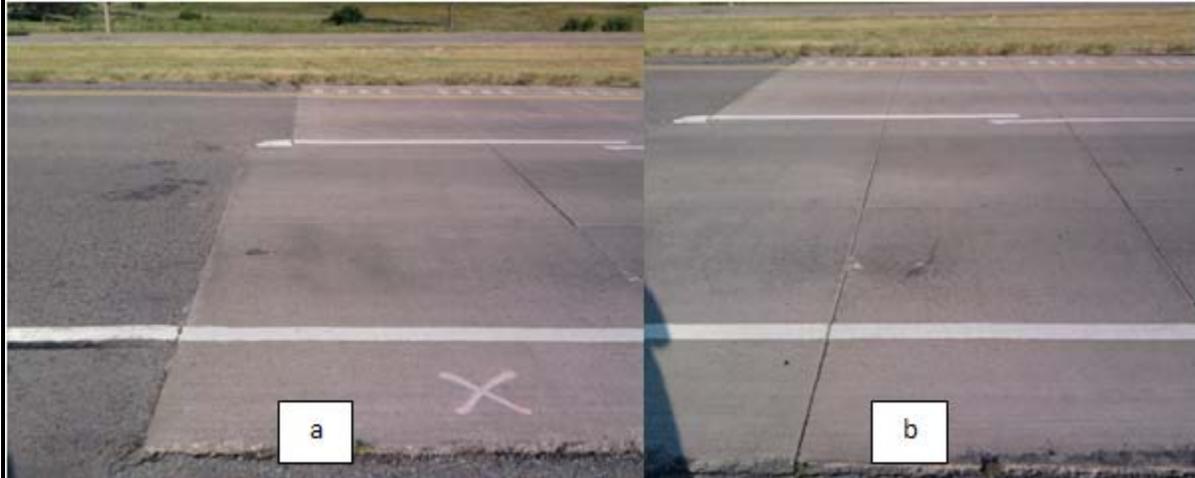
Photo a showing start of the overlay where the asphalt pavement ends. A corner crack was seen on the second panel right after the start of the overlay is shown in photo b.
